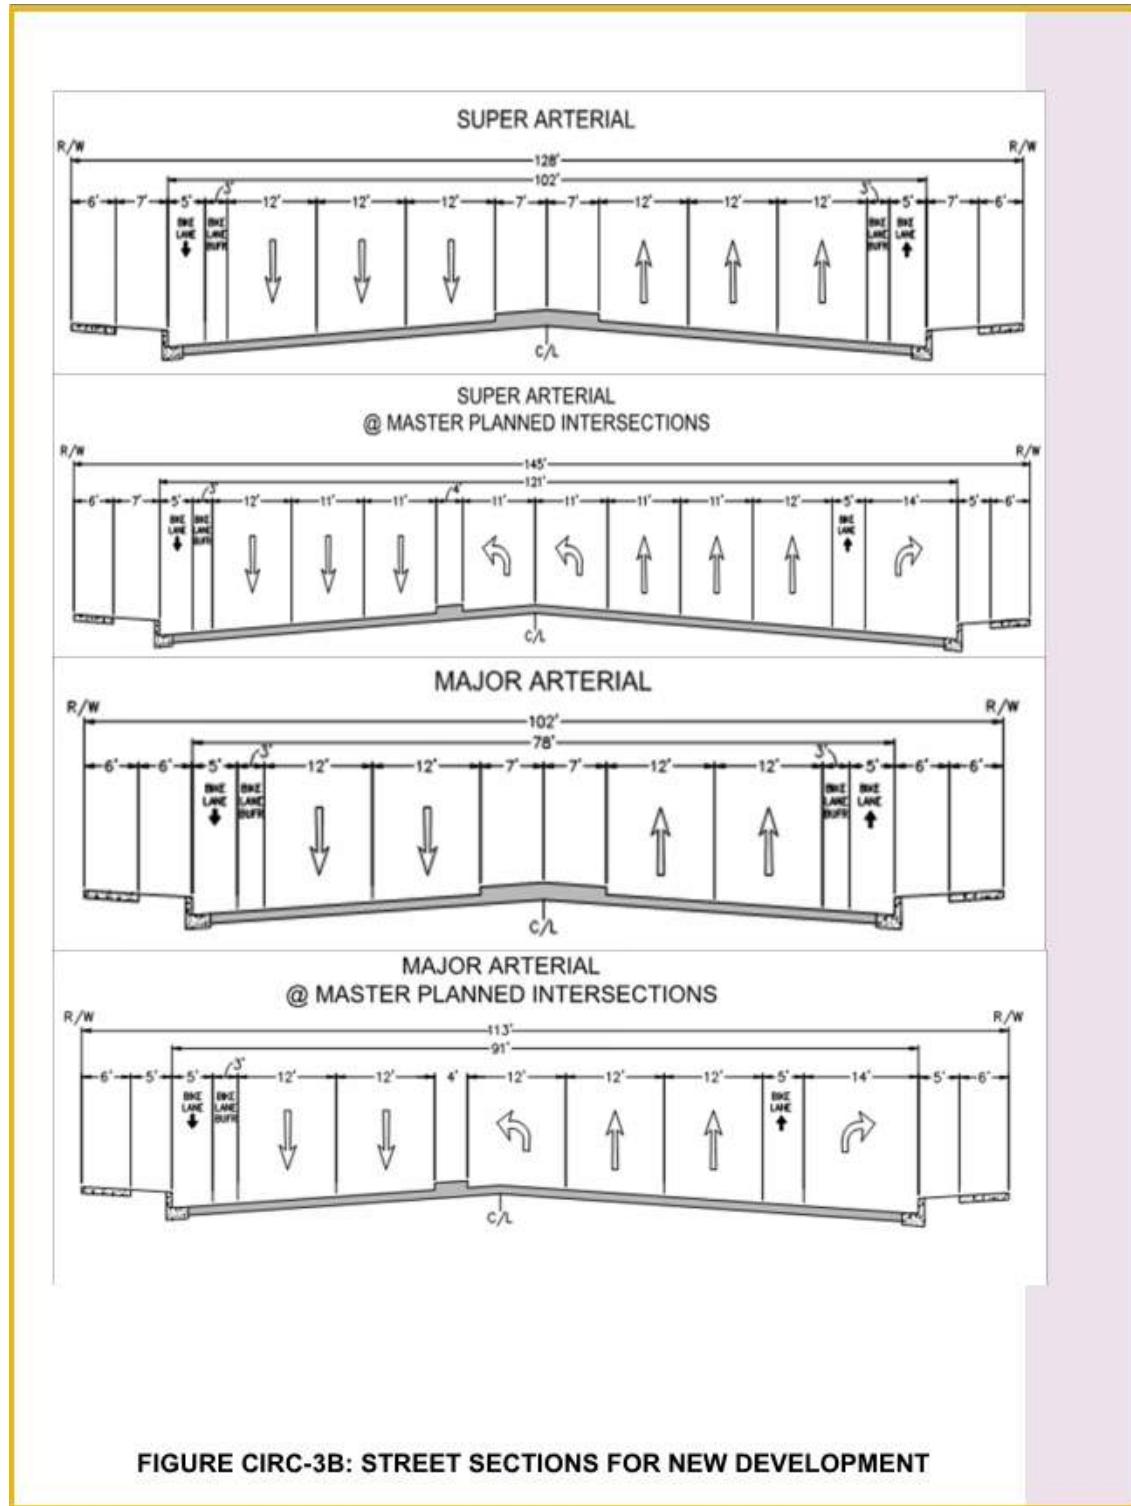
B: STREET SECTIONS FOR NEW DEVELOPMENT
